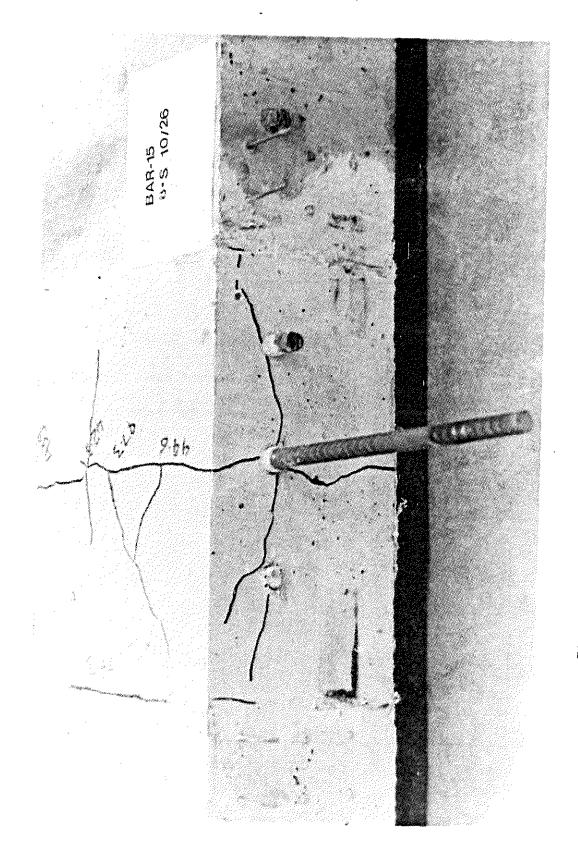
Typical Cracking Pattern after Test Bar Pullout
